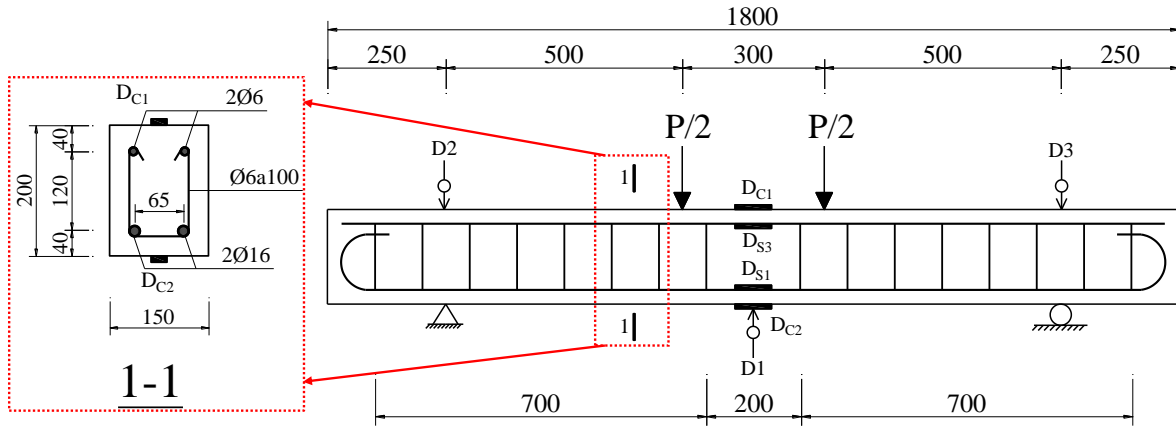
Layout of reinforced concrete beam specimen and four-point bending test
